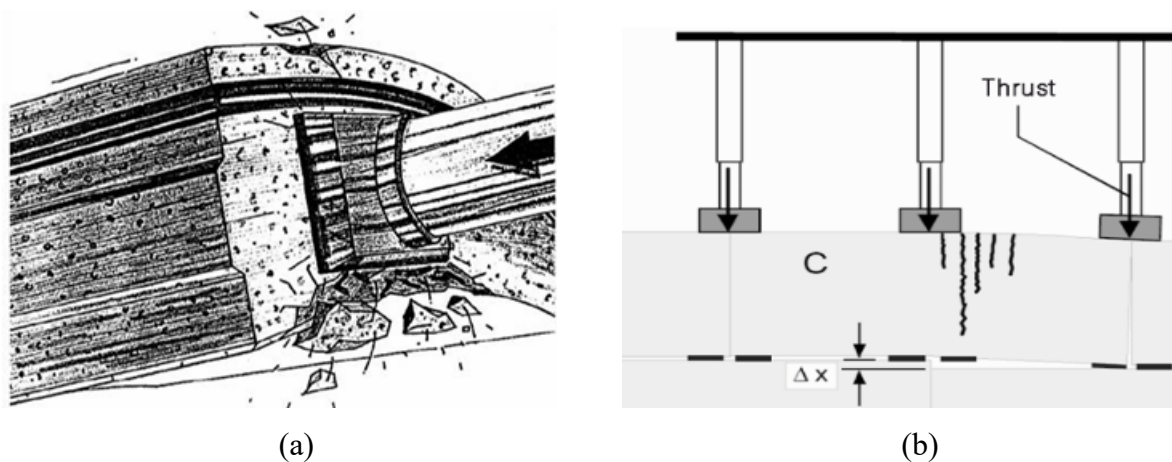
a) Spalling and cracking concrete cover, b) Damage from displacement in the ring groove (SIG WG2, 2019)
